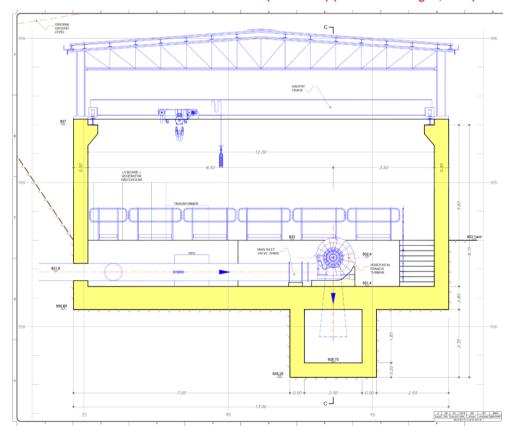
Powerhouse – Vertical Cross-section (Section B) (Studio Pietrangeli, 2019)
